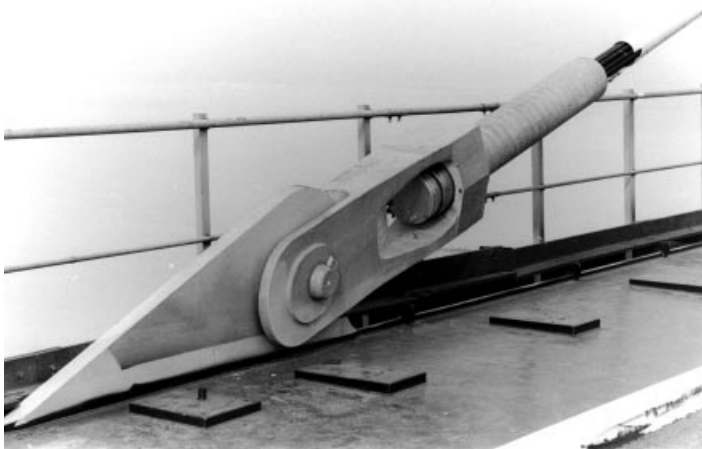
The anchor tube of the Stonecutters Bridge as seen from the roadway
